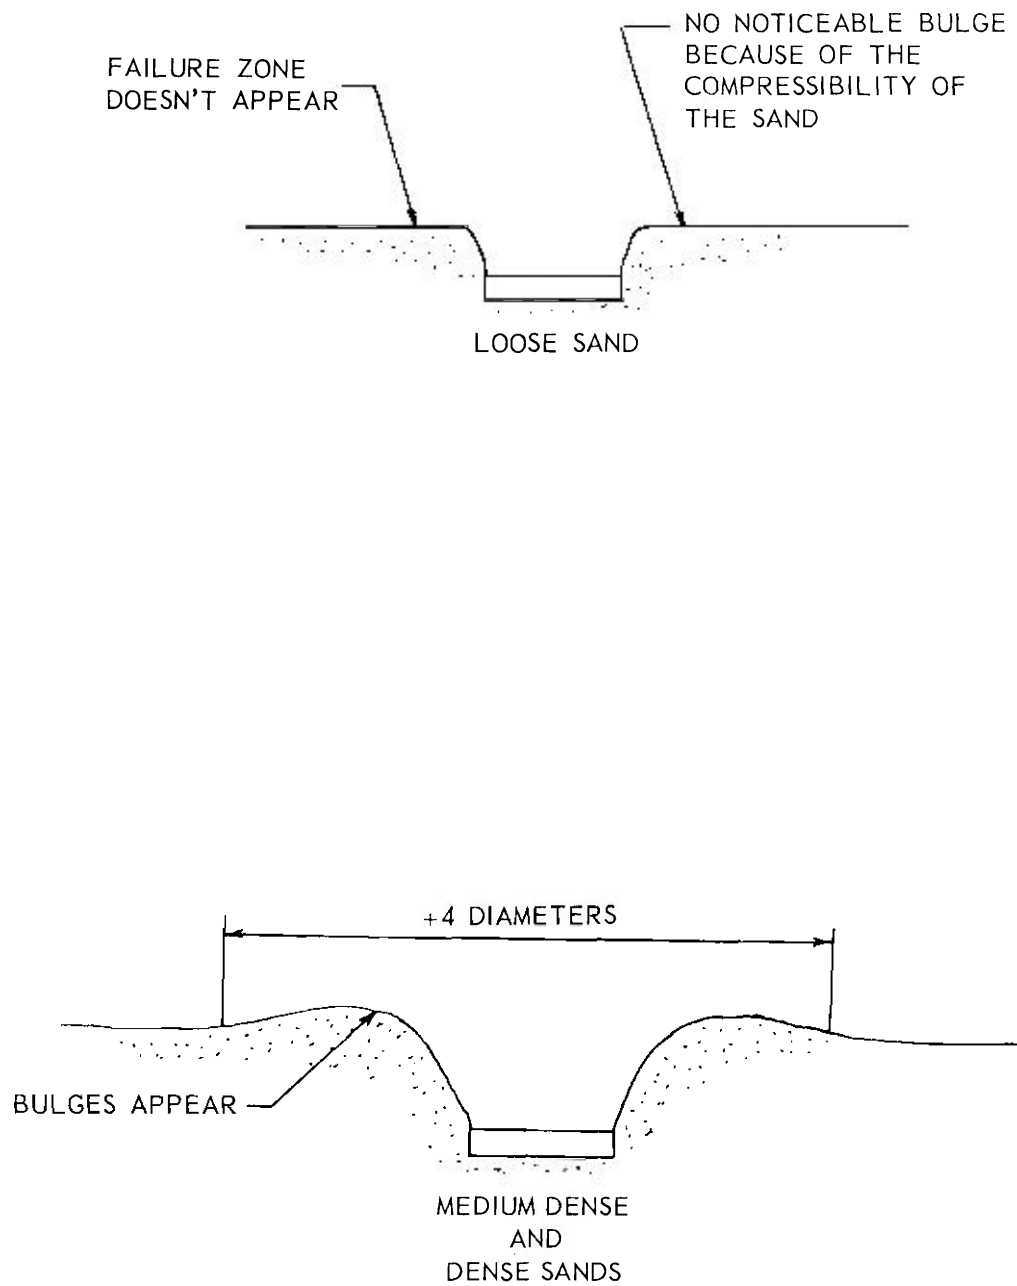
Cross Sections Across the Center of the Footing After Failure has Occurred.
